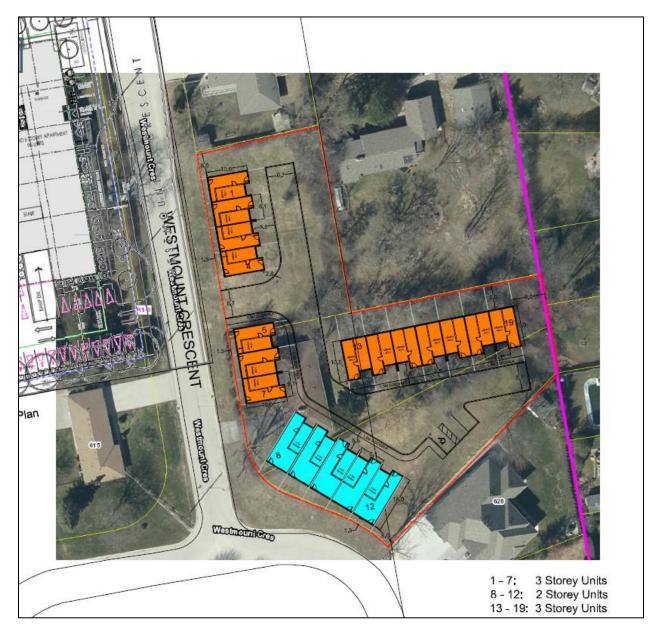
Revised Plan with access aligned with 608 Commissioners Rd W
